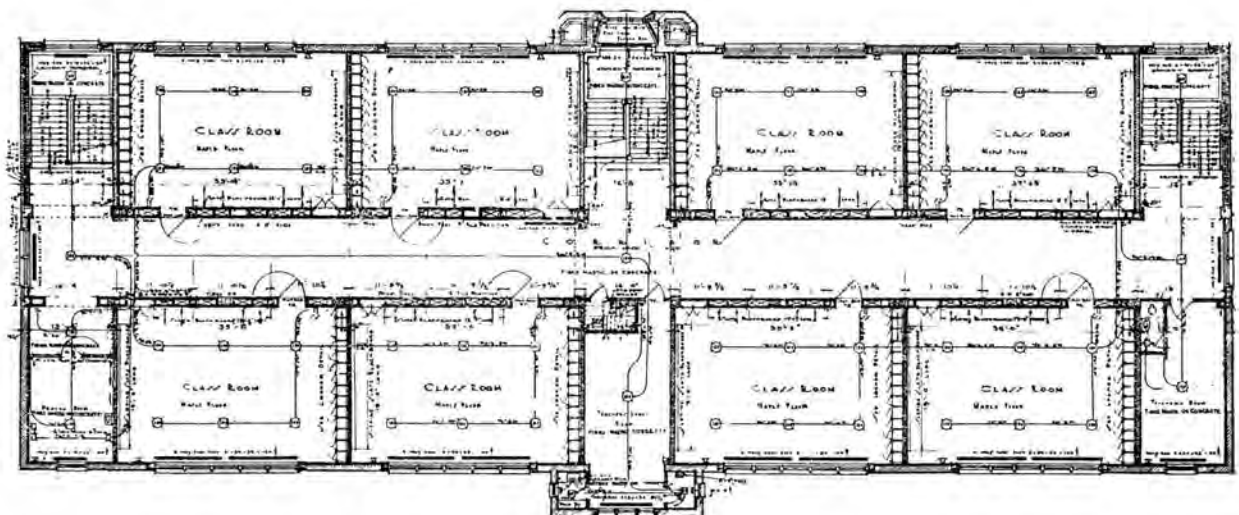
SECOND FLOOR PLAN, ROSE AVENUE SCHOOL, TORONTO
